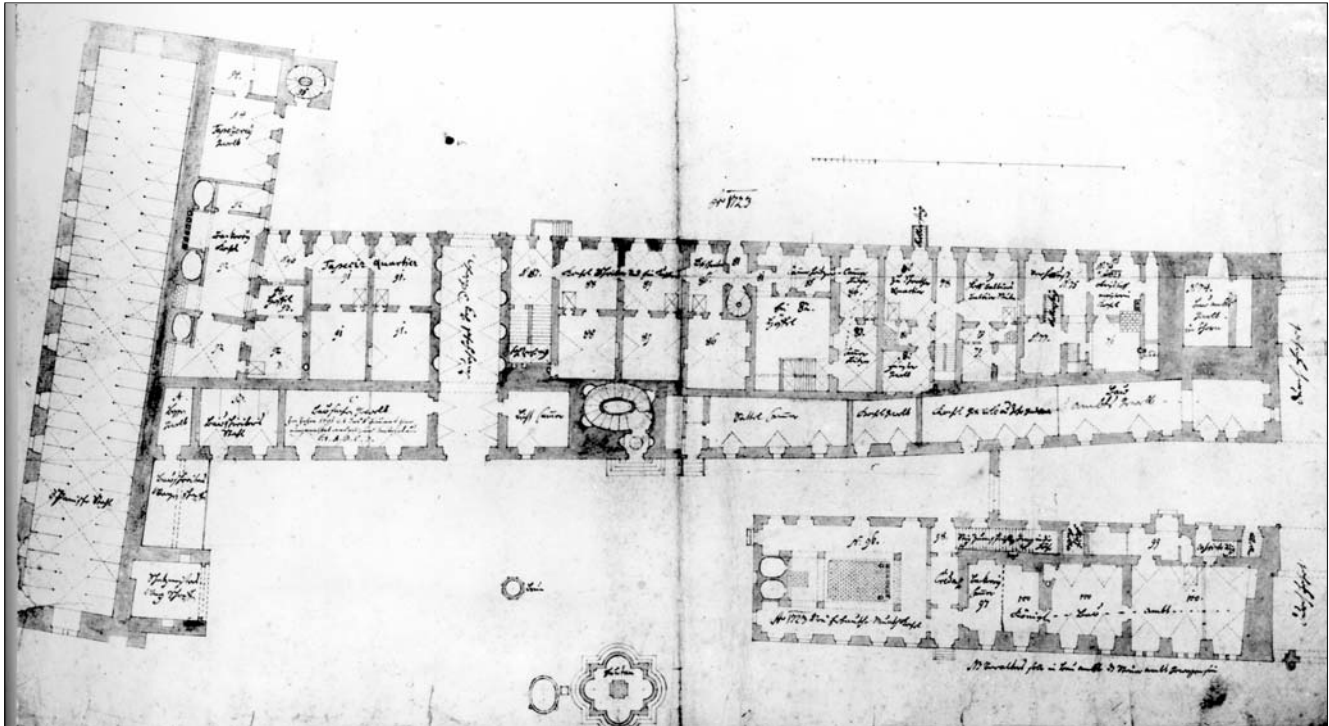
Prague Castle, ground floor of Central Wing on J. Dienebier's plan from 1723.
